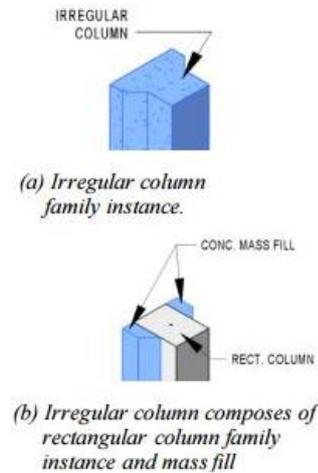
Modeling of irregular column (Source: (*Standard Approach of Modelling(SAM)*,2014) [13], p.9).
